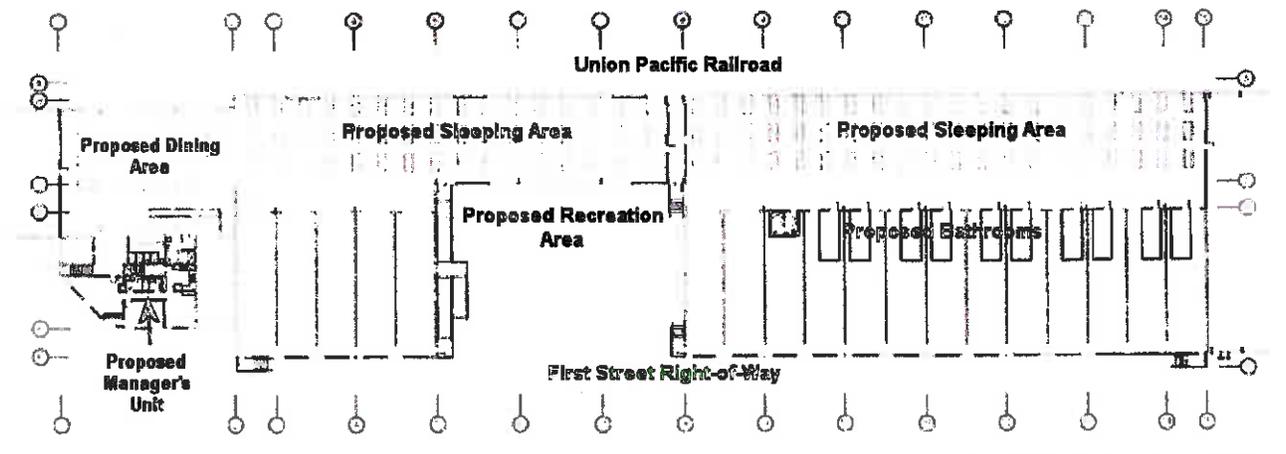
Revised Floor Plan Farmworker Housing 218 N. First Street
